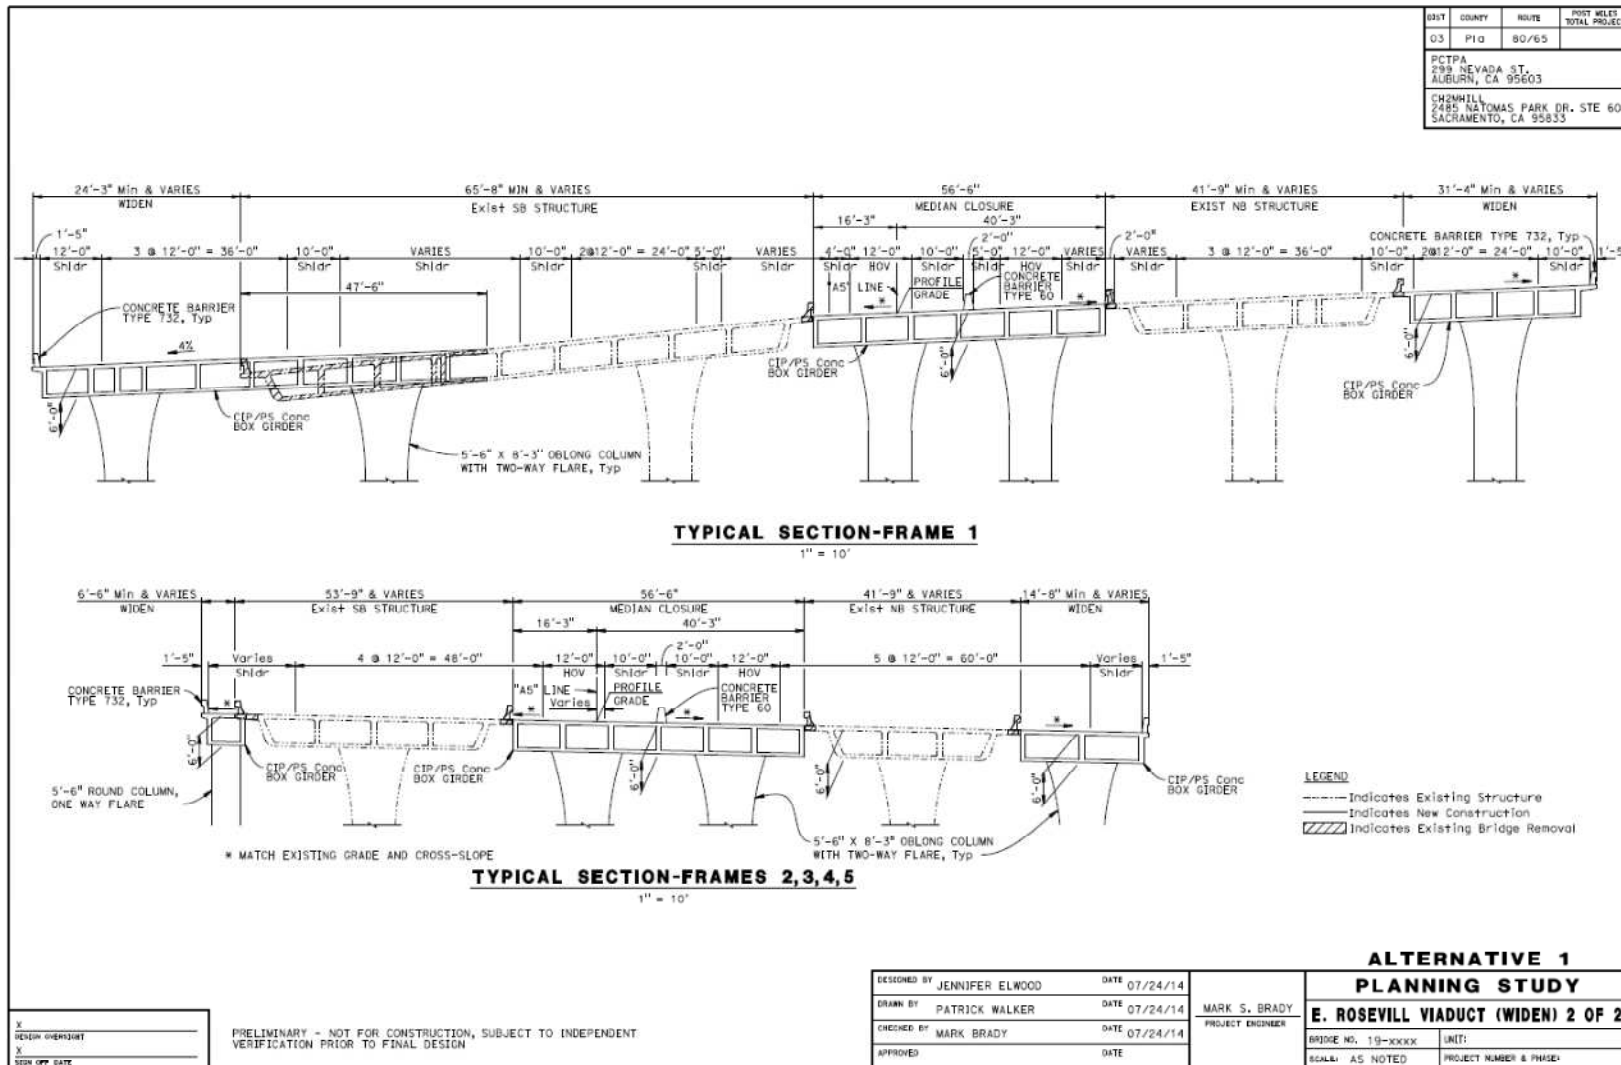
East Roseville Viaduct Proposed Bridge Plan (Alternative 1) (2 of 2)
